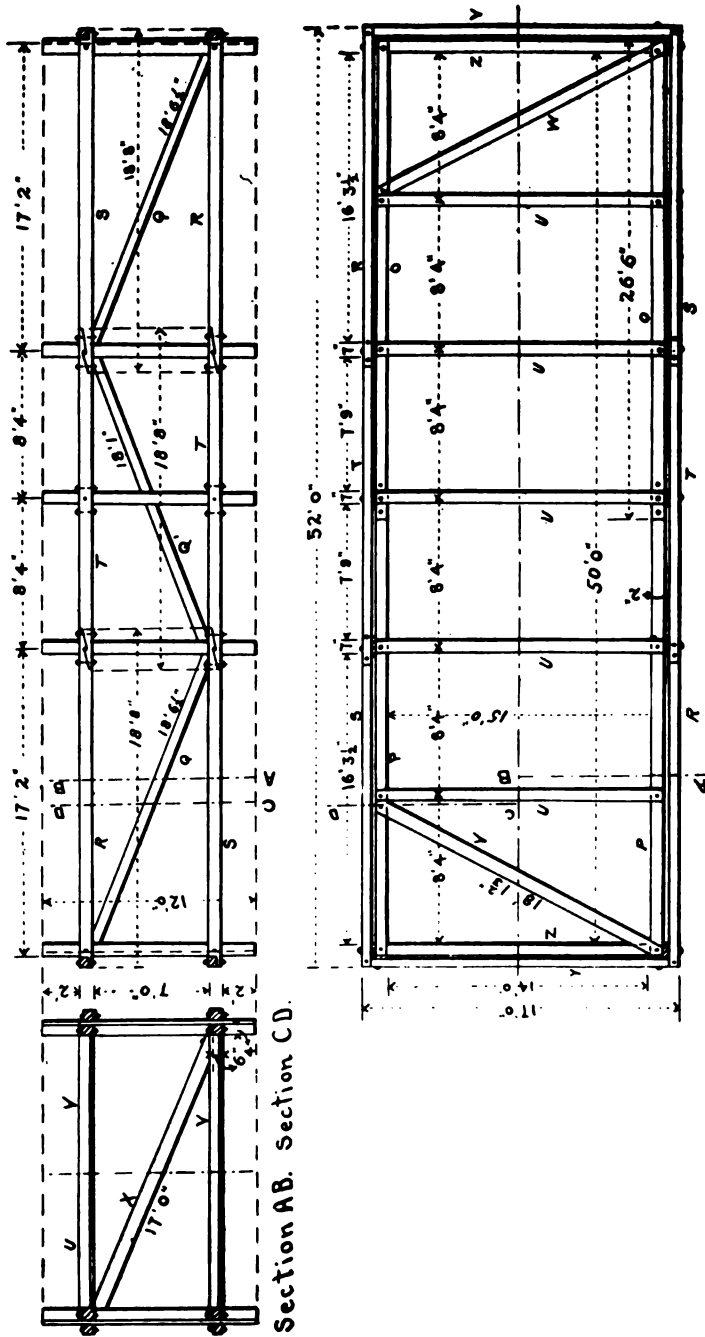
CHATTANOOGA BRIDGE BED ROCK PIER NO. 3.
